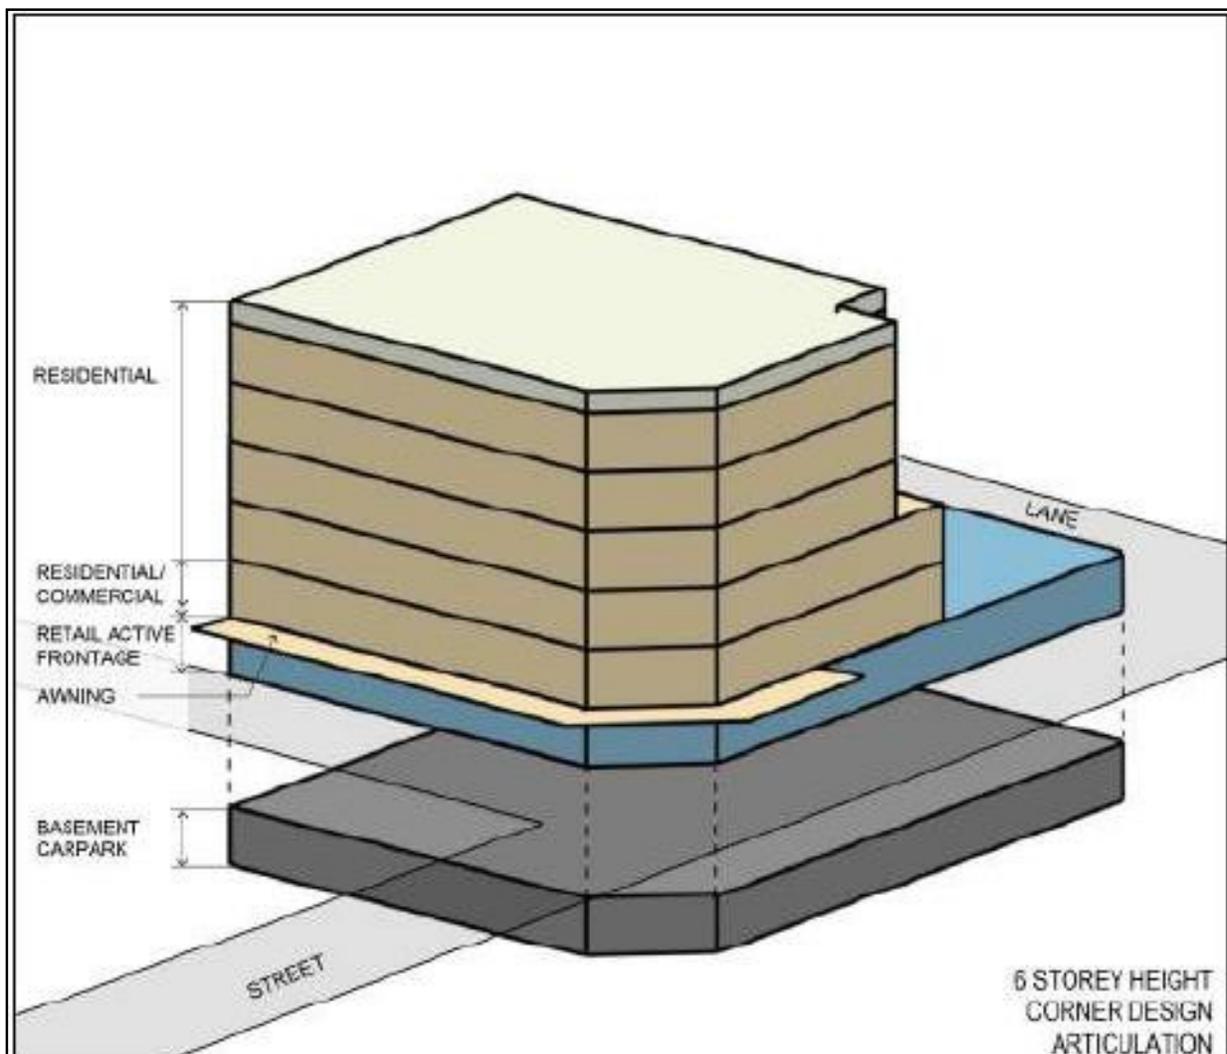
Gateway corner site design articulation (Fairfield Heights Town Centre Urban Design Study, 2018)
